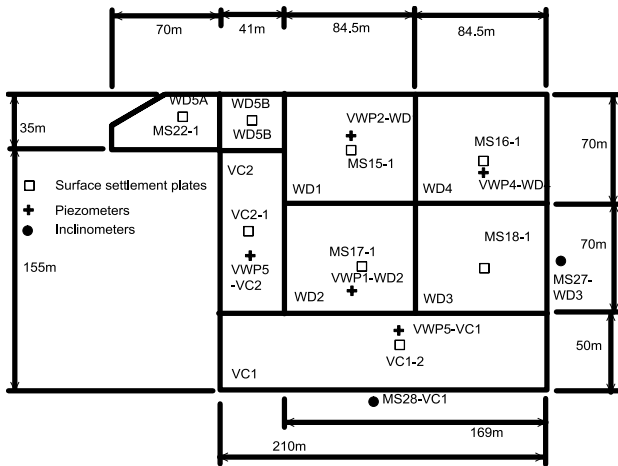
Site layout for S3A with instrumentation plan (Indraratna et al. 2011)
